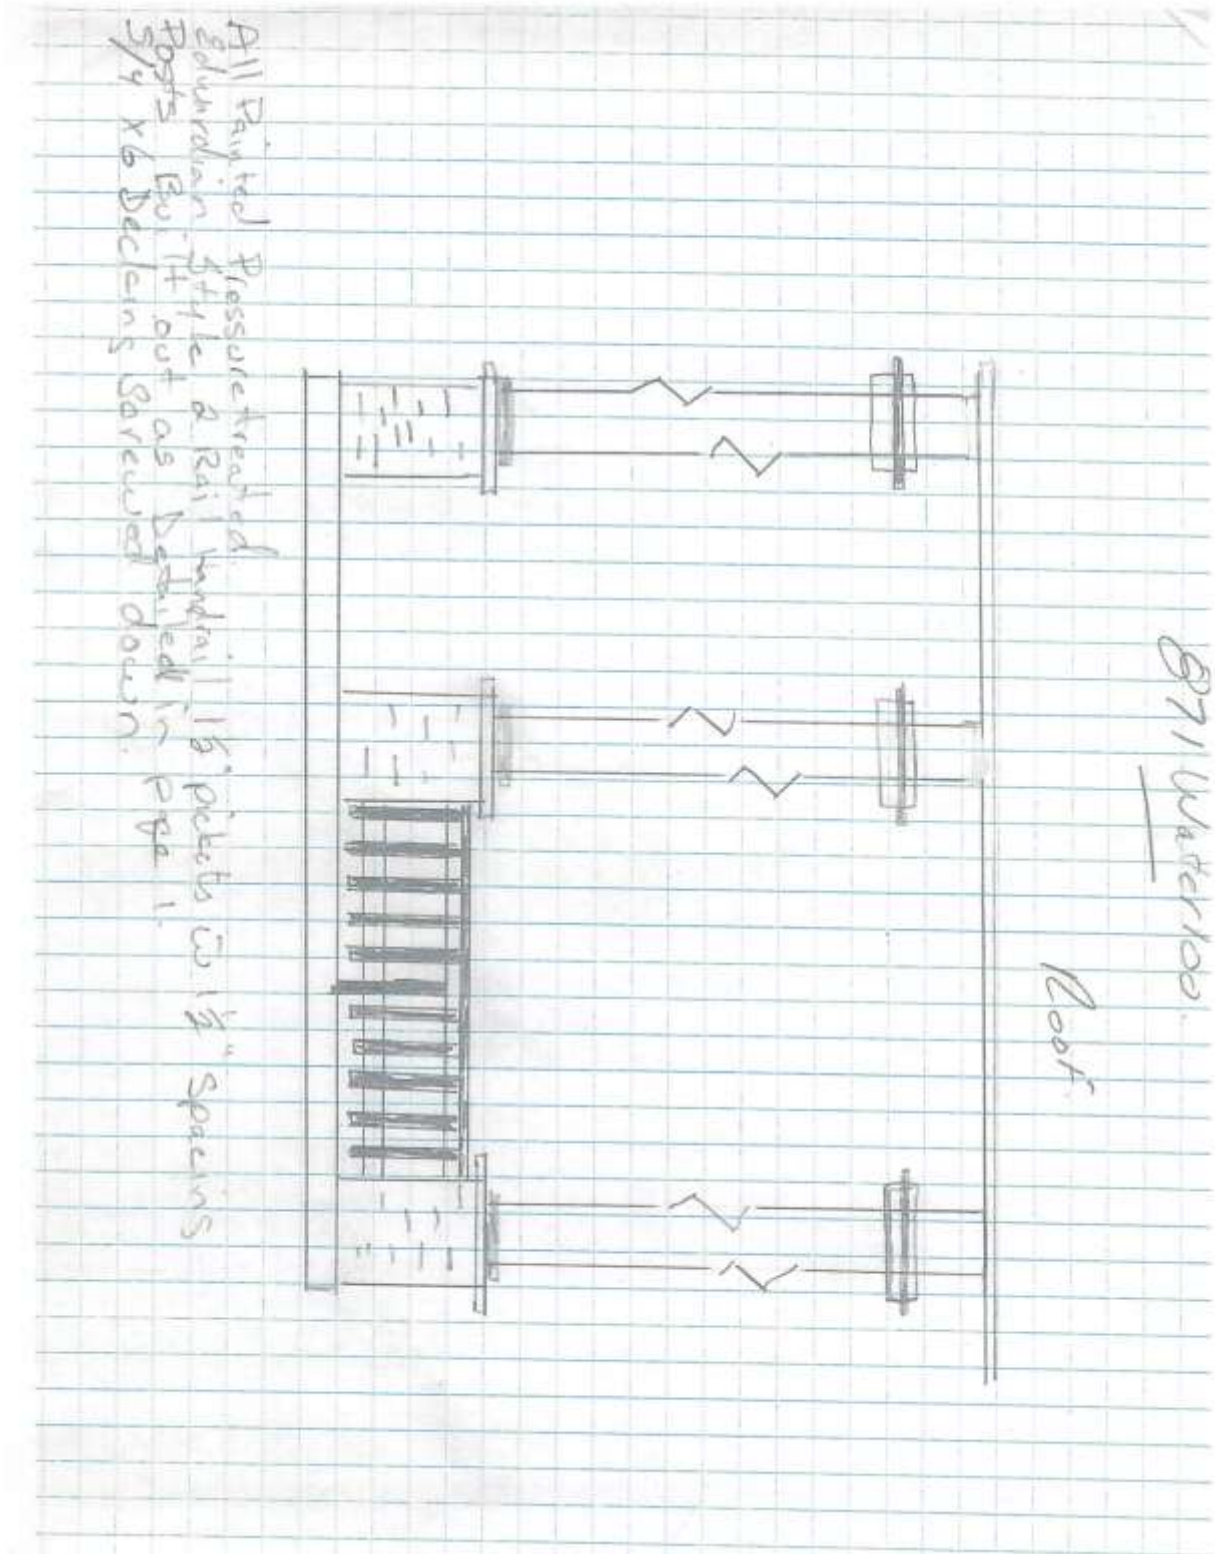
Detail of the front steps at 871 Waterloo Street (March 31, 2015).
